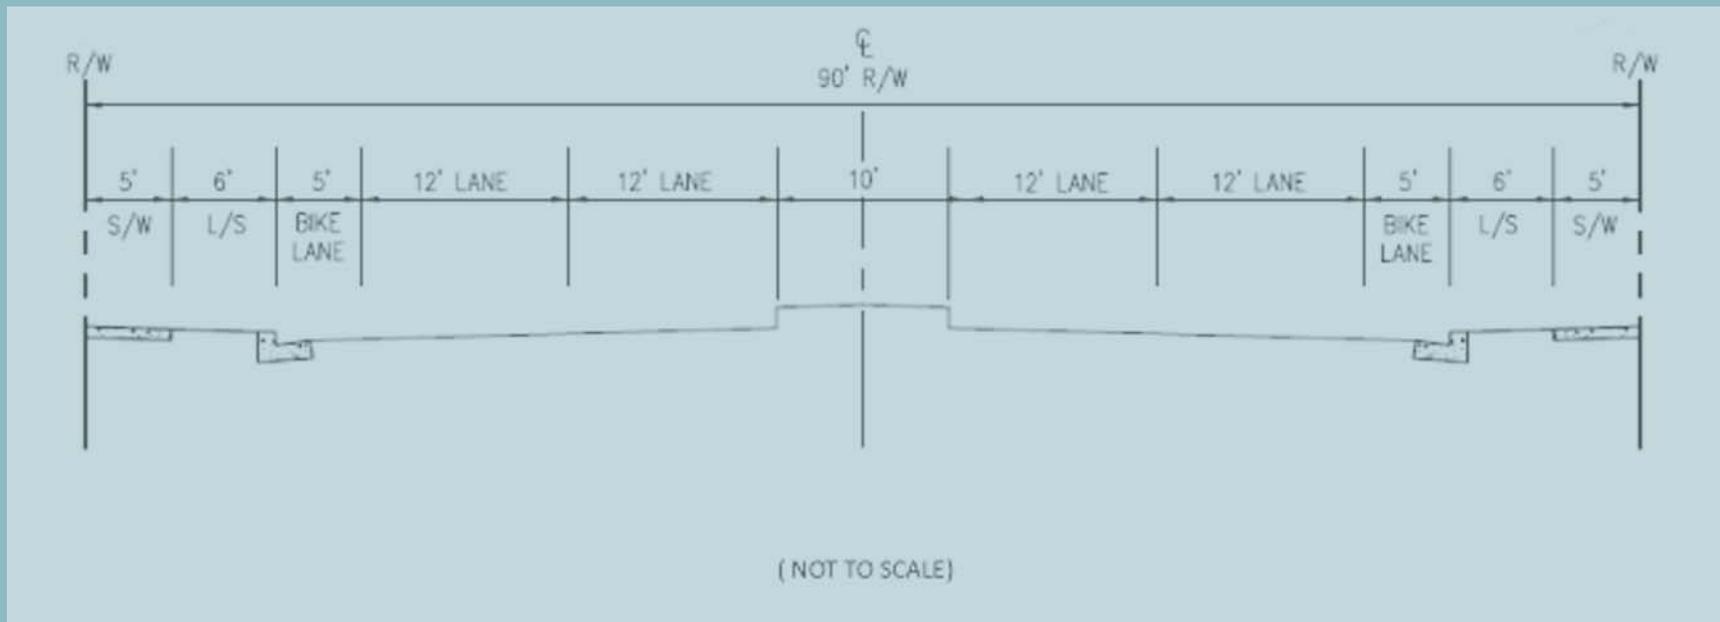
Enterprise Drive East (East of Willow Street)
